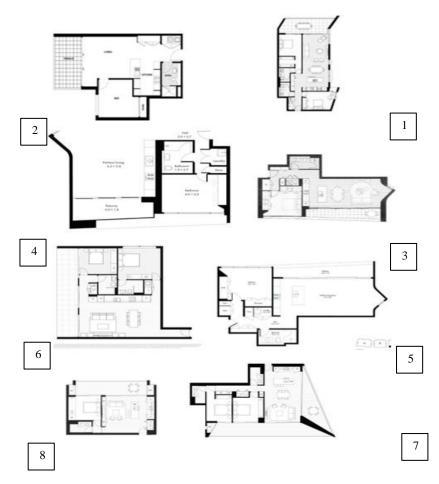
Honeysuckle Floor Plans 0-8 (Domain, 2022)
